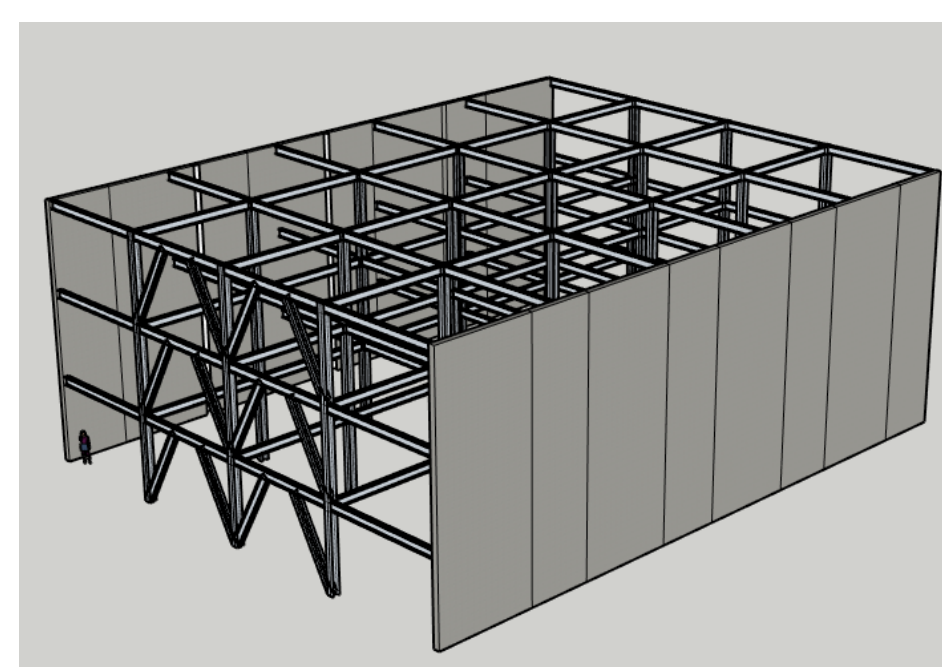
Type C - Concrete walls and steel frames in orthogonal directions
